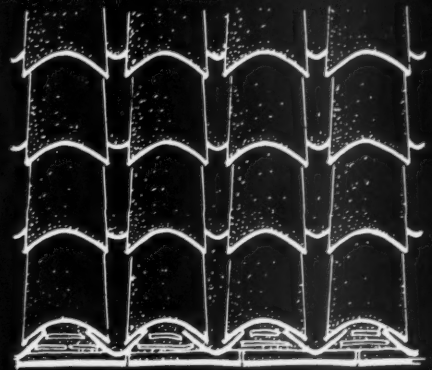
DETAILS OF 'TRITON SEVILLE' HAND MADE CLAY ROOFING TILES
